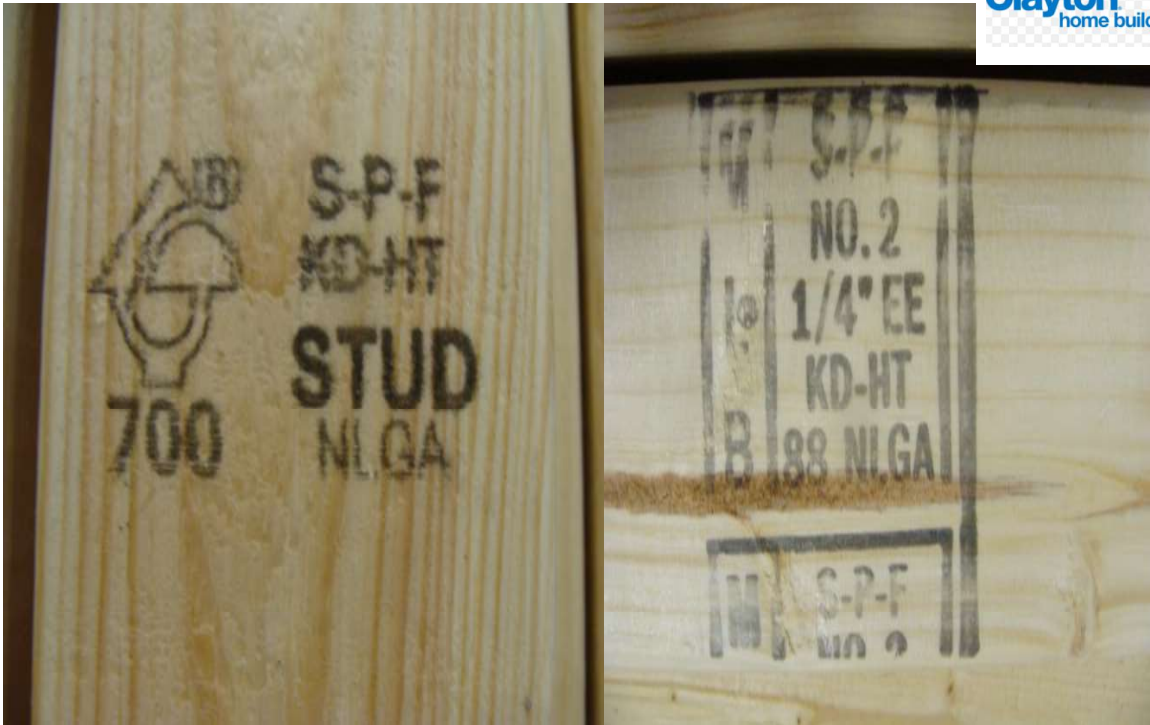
Typical 2x3 SPF Stud (left) and 1x3 SPF Plate (right)
